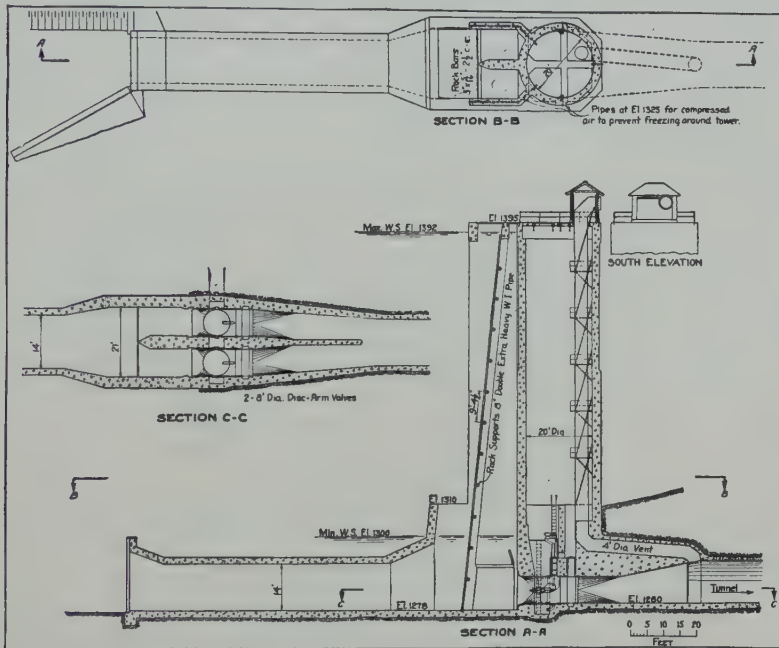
Reservoir outlet power and headgates—Davis Bridge plant, New England Power Company.
